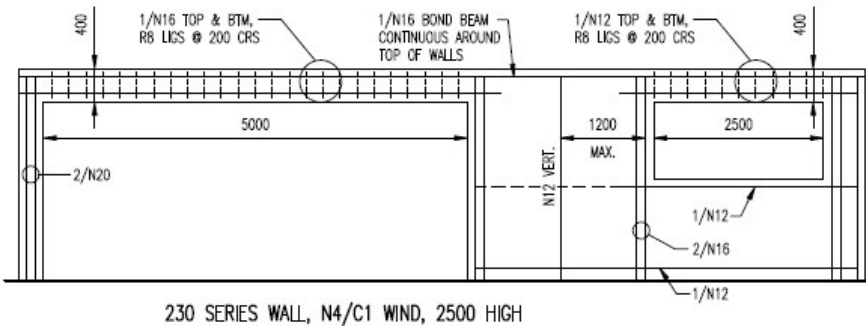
2500 High Wall, N4/C1 Wind Rating, 230 Series ECO-Block (Max. roof load width: 5.2m)
